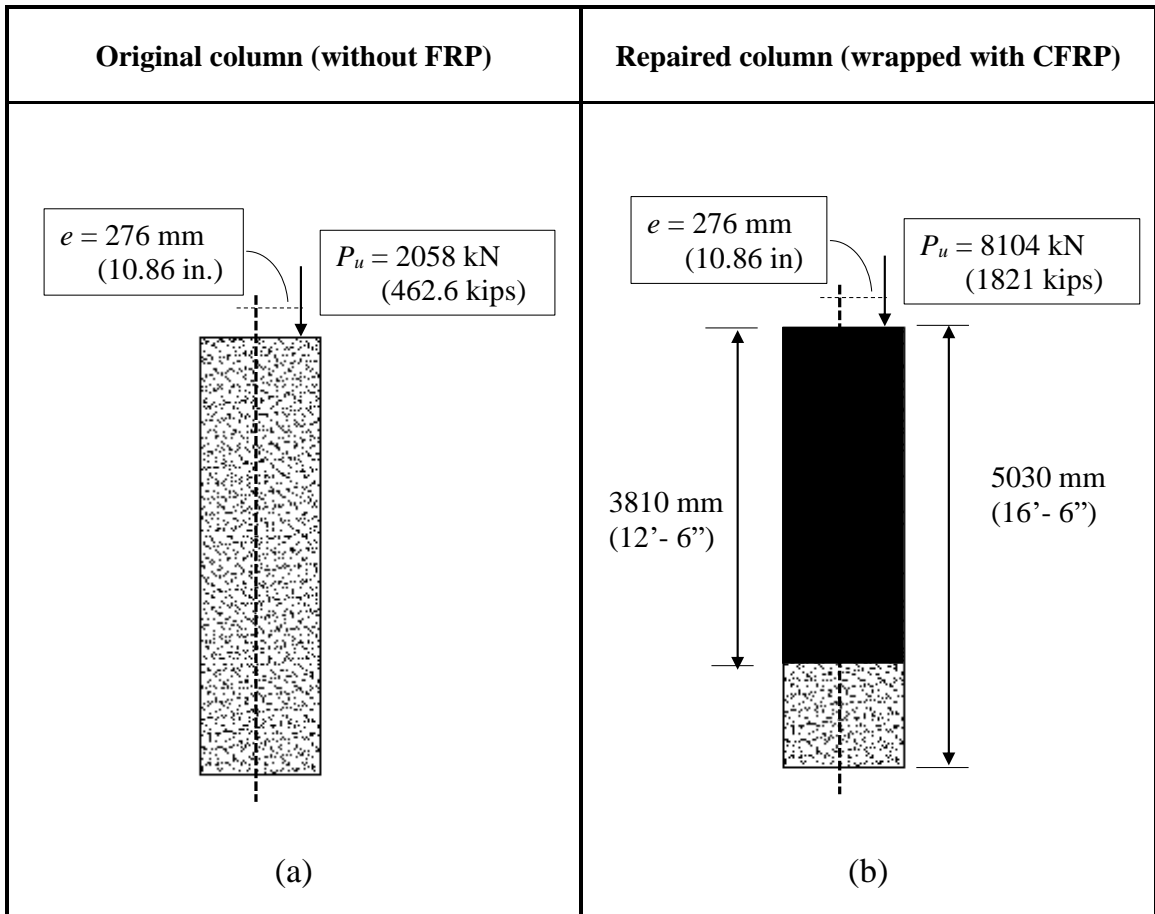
The axial capacity of the bridge column: (a) original or as constructed column; and (b) CFRP wrapped column
